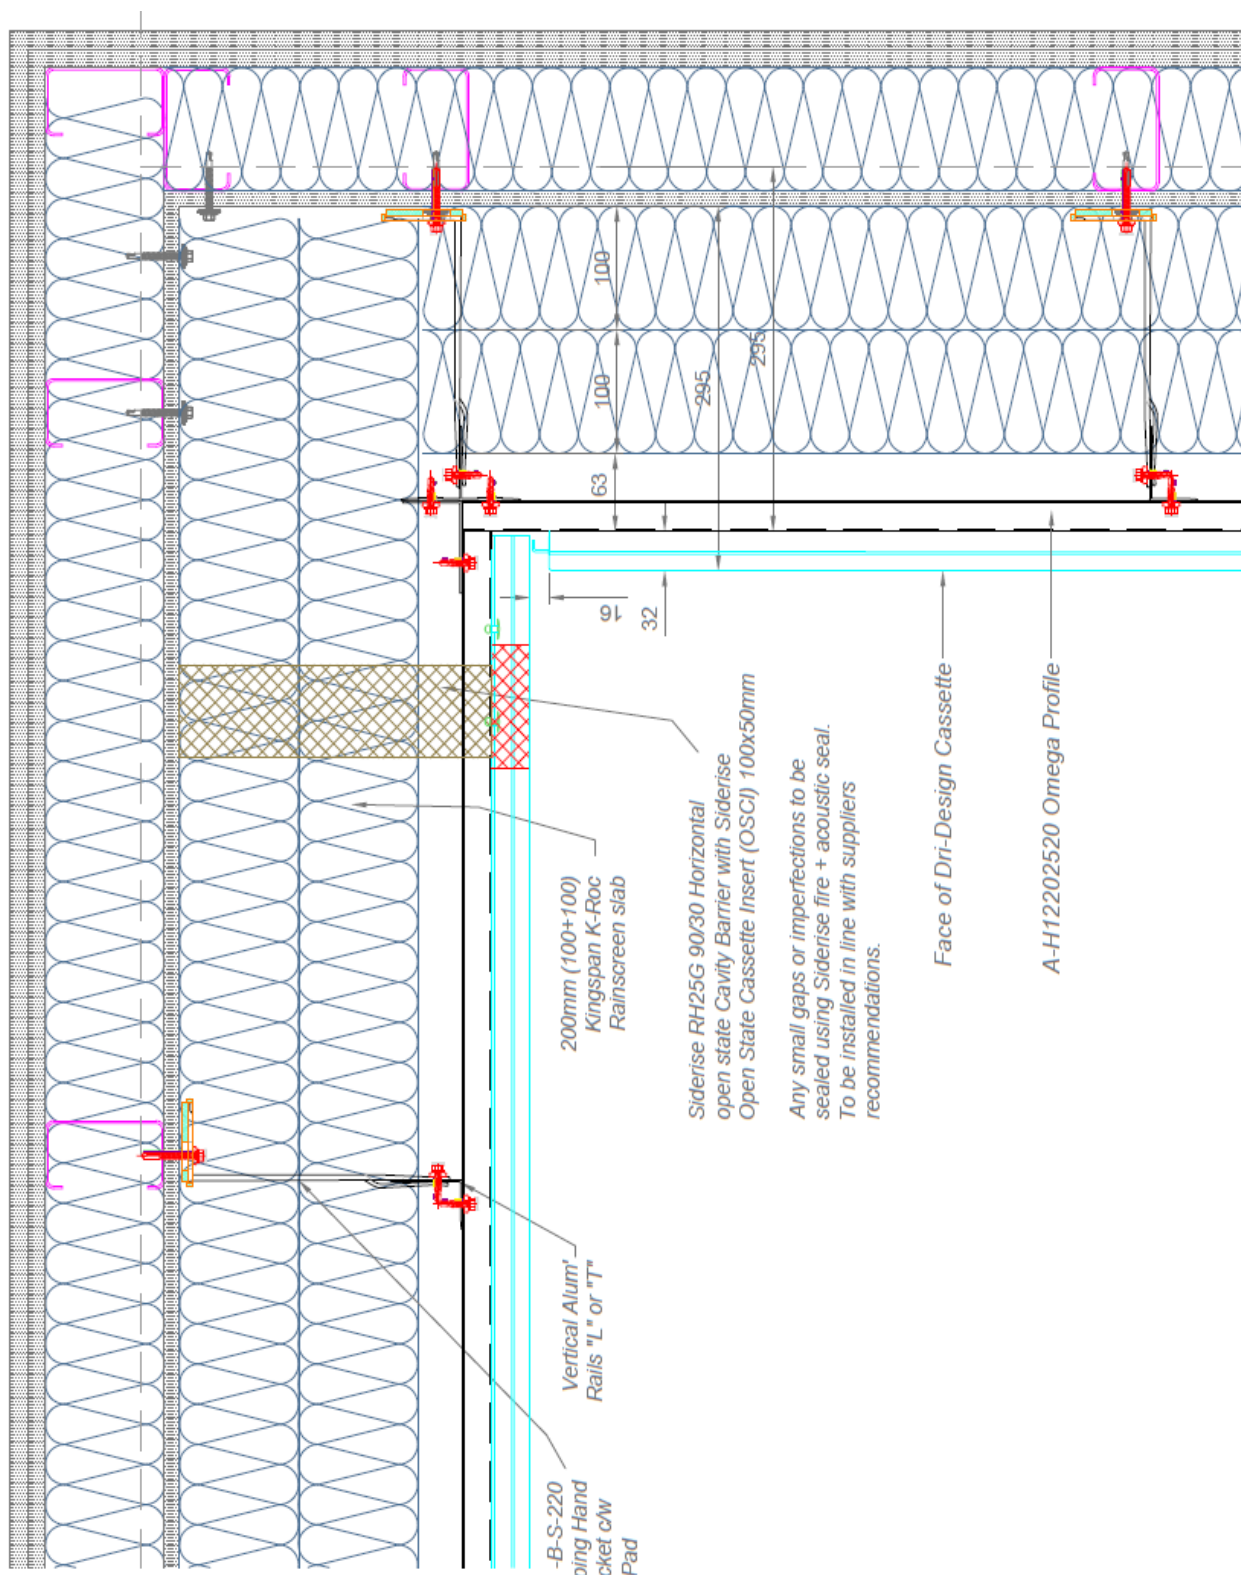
Sketch of façade system detail. Horizontal section – internal corner.
